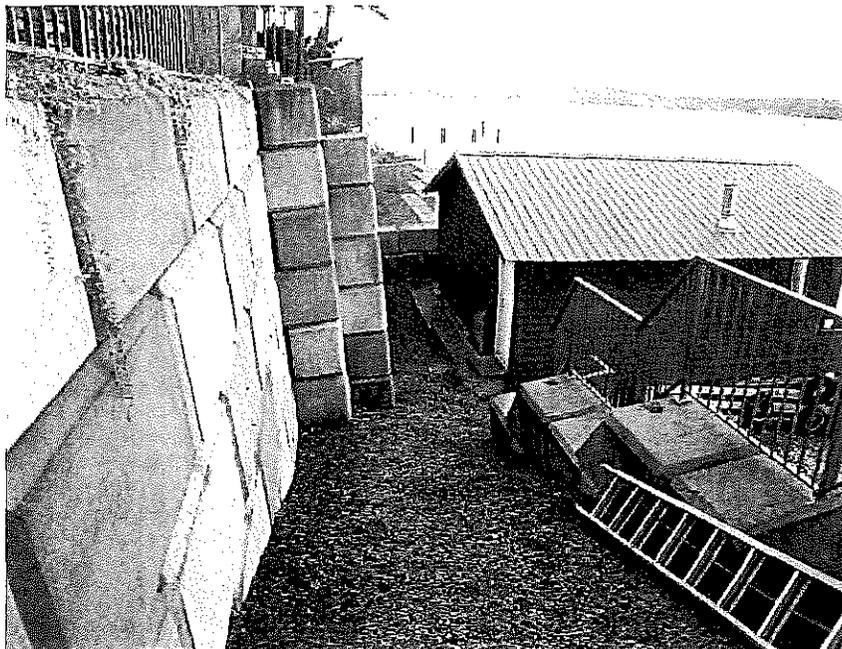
Looking northwest at the gravel walkway that provides access to the boat house and foreshore area.
